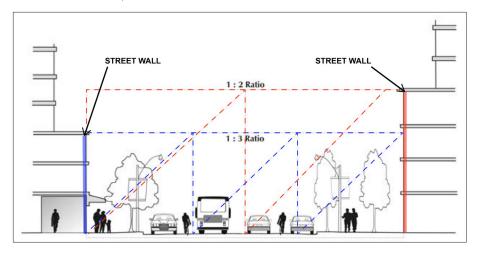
A building height-to-street-width ratio of between approximately 1:3 and 1:2 is recommended to frame streets and provide human scale. Portions of buildings above the street wall are encouraged to step back.
